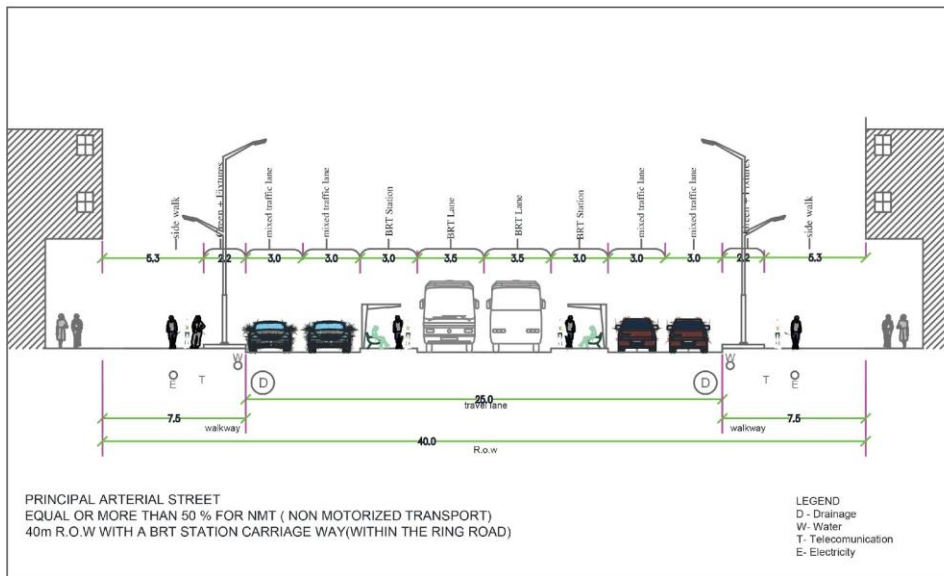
Street section (b) of Principal Arterial Road inside the inner ring road
